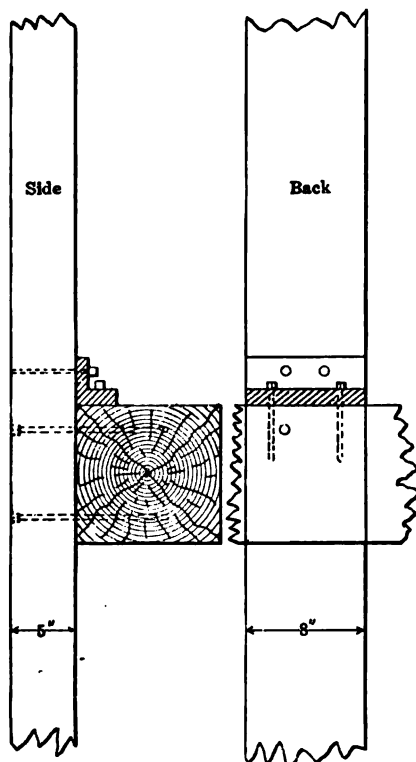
METHOD OF SUPPORTING SHAFT GUIDES.
